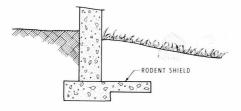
A horizontal shield on the outside of the foundation wall discourages burrowing rodents.
